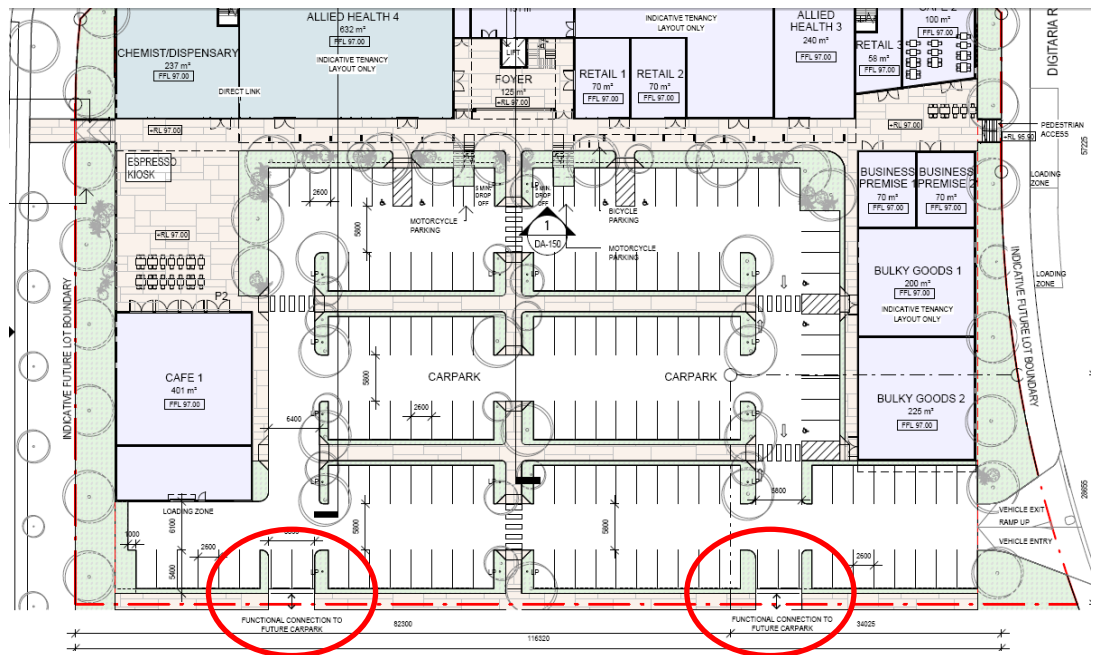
Extract of the site plan, future potential functional vehicular connections to adjacent site to the east circled in red (Source: AN+A)
